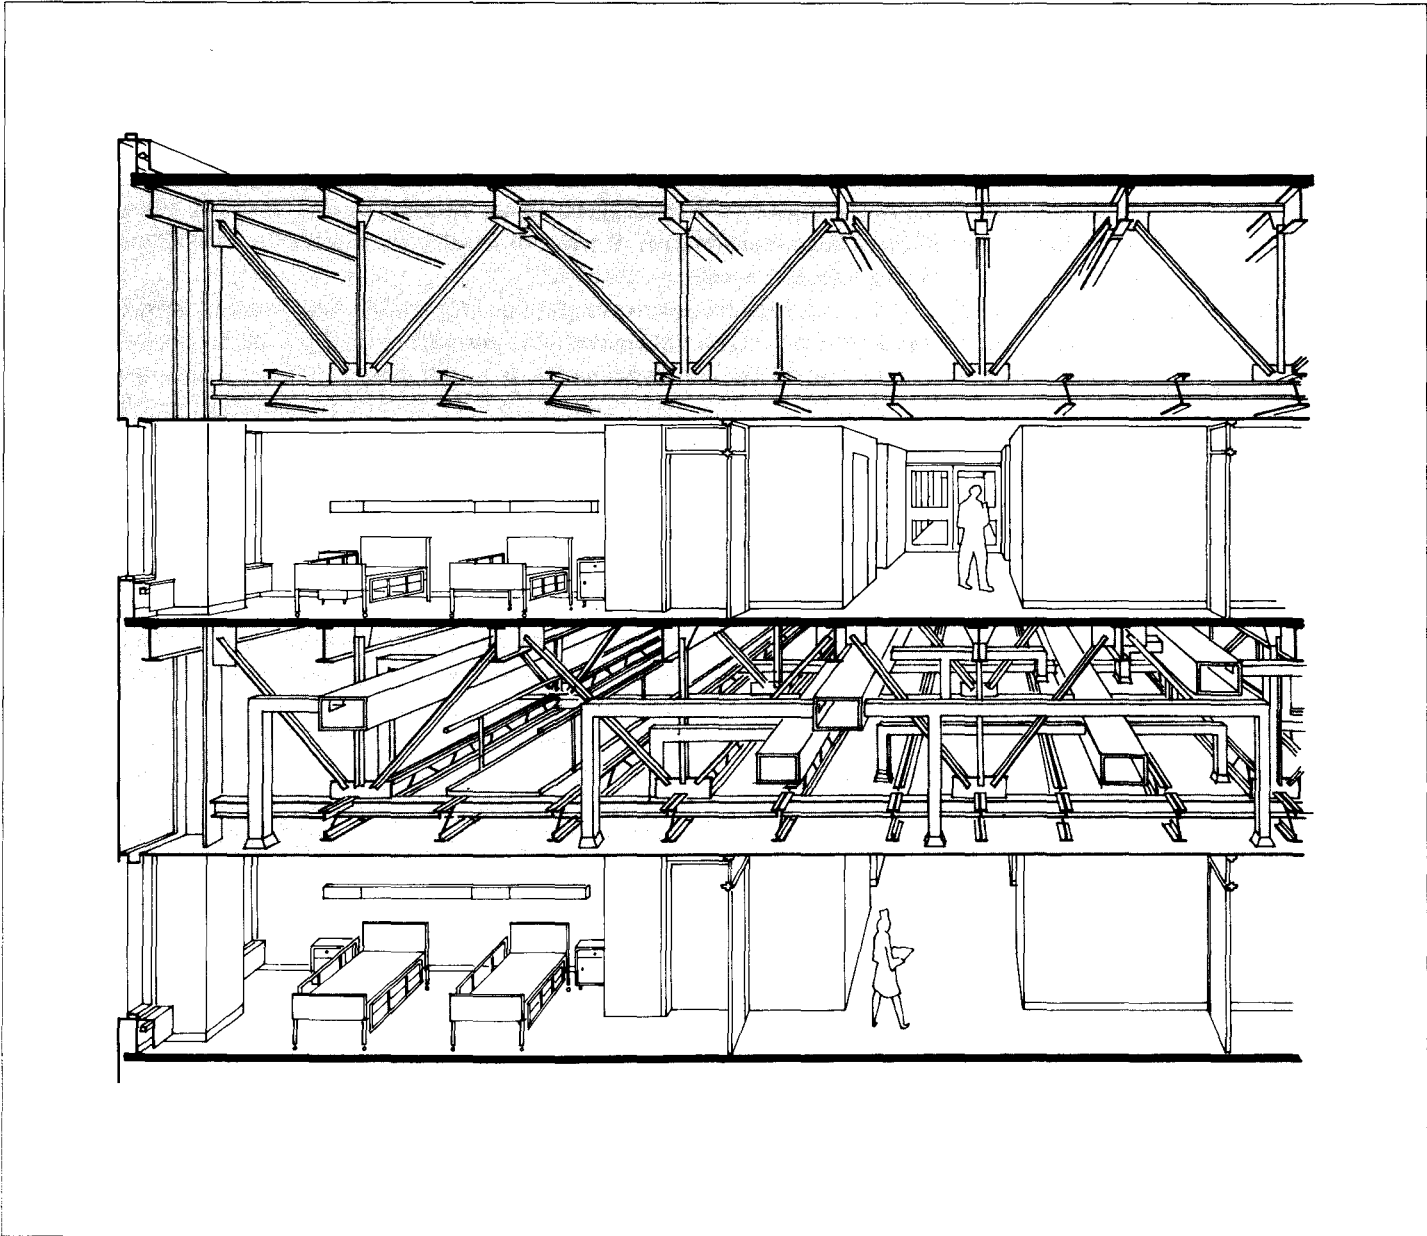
Section through hospital floors and walk-through ceiling spaces created by the *interstitial truss system*.
